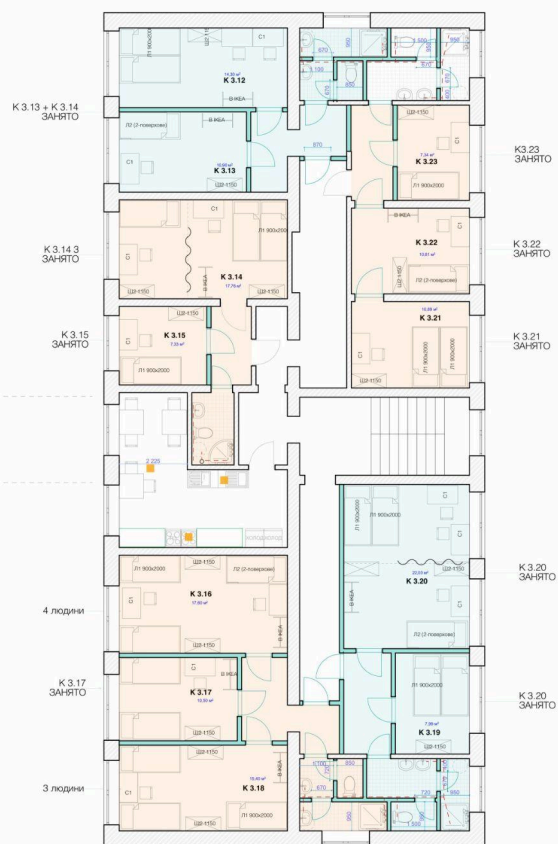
Sadok – Section 3, 2nd Floor Plan
